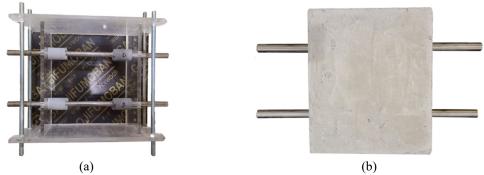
Concrete block casting (a) acrylic formwork with dowel connections and high-strength rings, (b) hardened concrete block with high-strength ring strengthened dowel connections.
